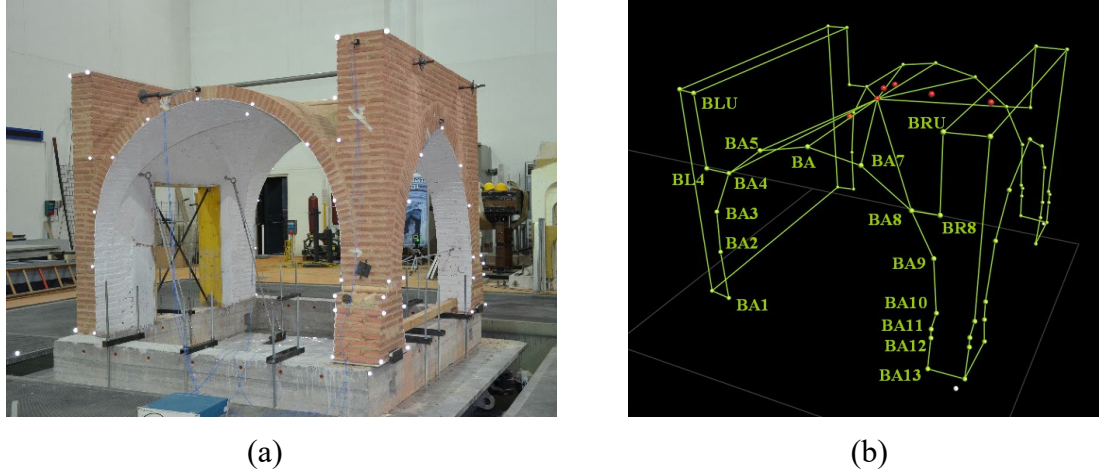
Tested specimen with markers in white (a) and 3D markers reconstruction (b).
